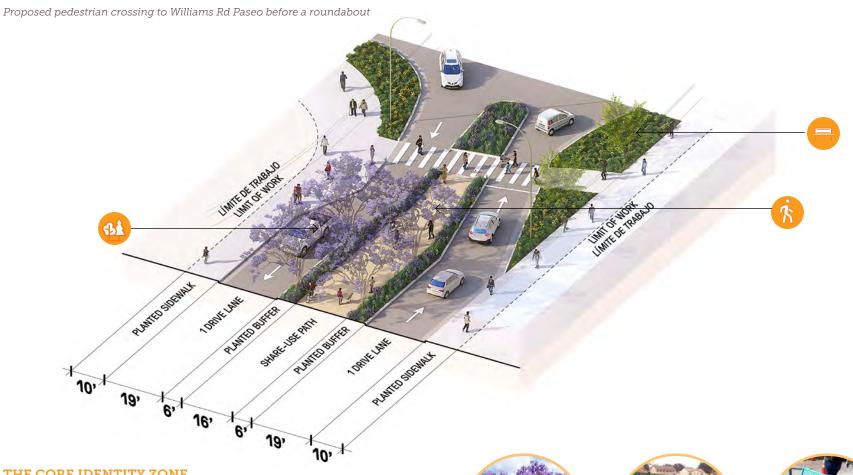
WILIAMS ROAD AND EAST MARKET STREET INTERSECTION - FOCUS AREA VISION
